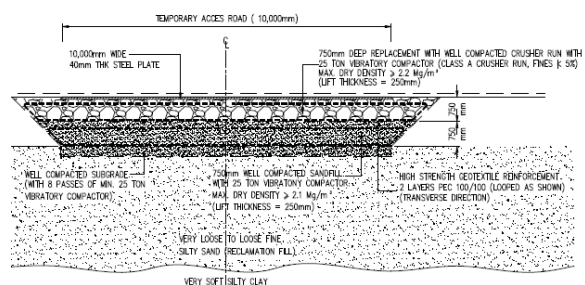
Detail cross section of the access road with geotextile reinforcement
